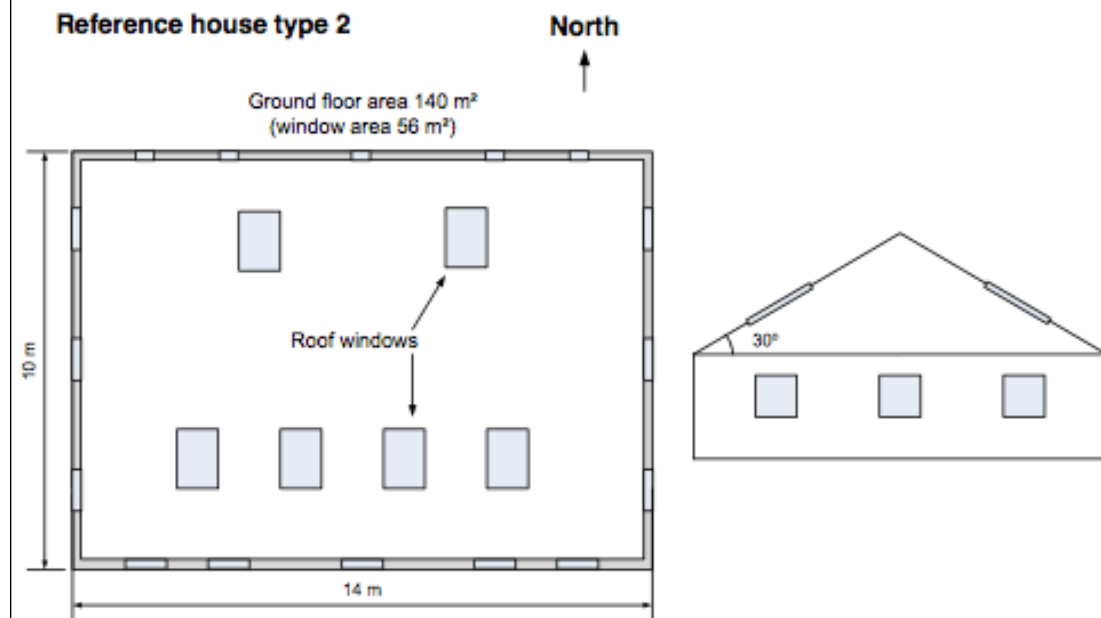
Outline of the reference house type 2 with 30° sloped roof construction
